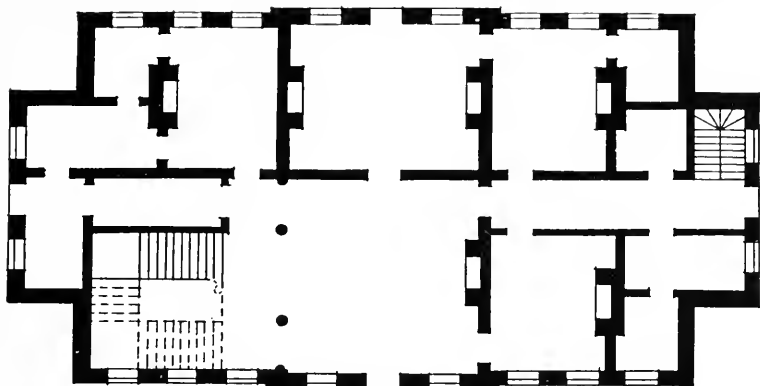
Floor plan, Cound Hall, from Waterman, p.108.
